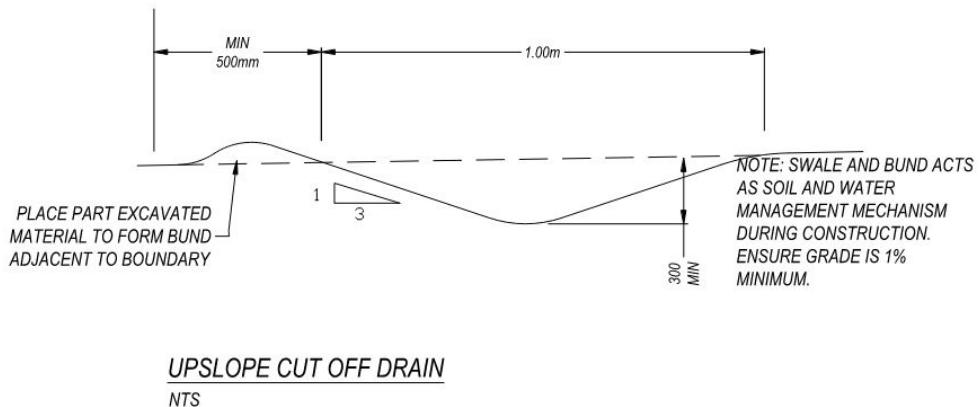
PROPOSED UPSLOPE CUT OFF DRAIN
